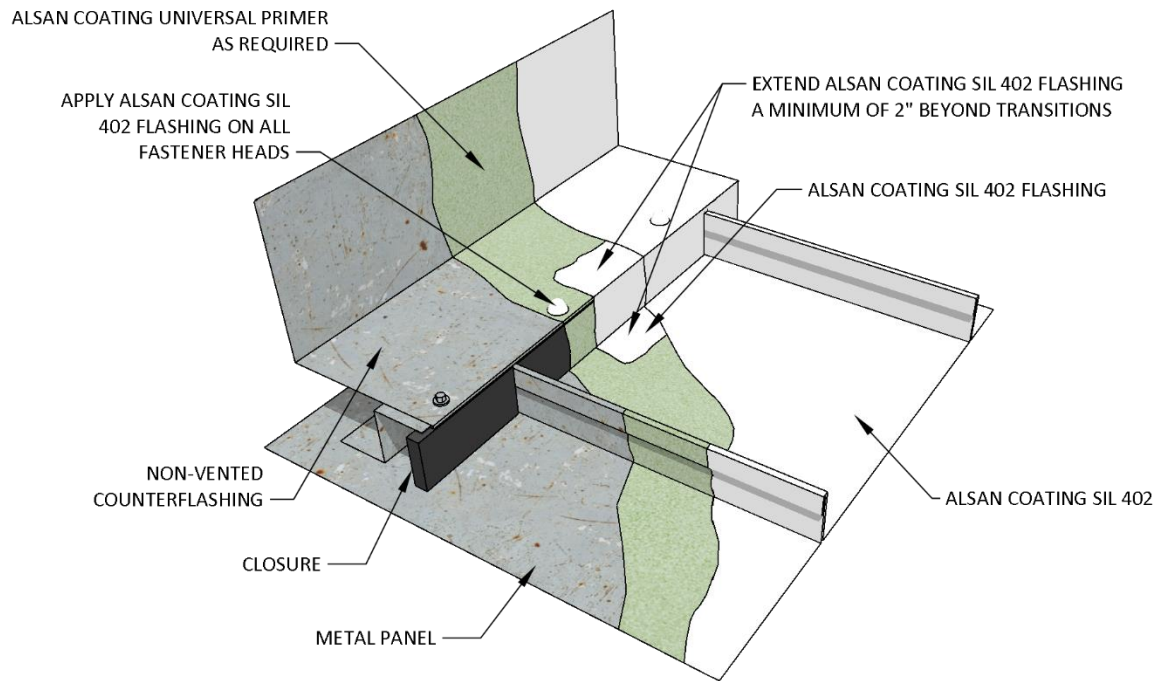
Silicone Roof Coating Over Standing Seam Metal, Wall/Curb
